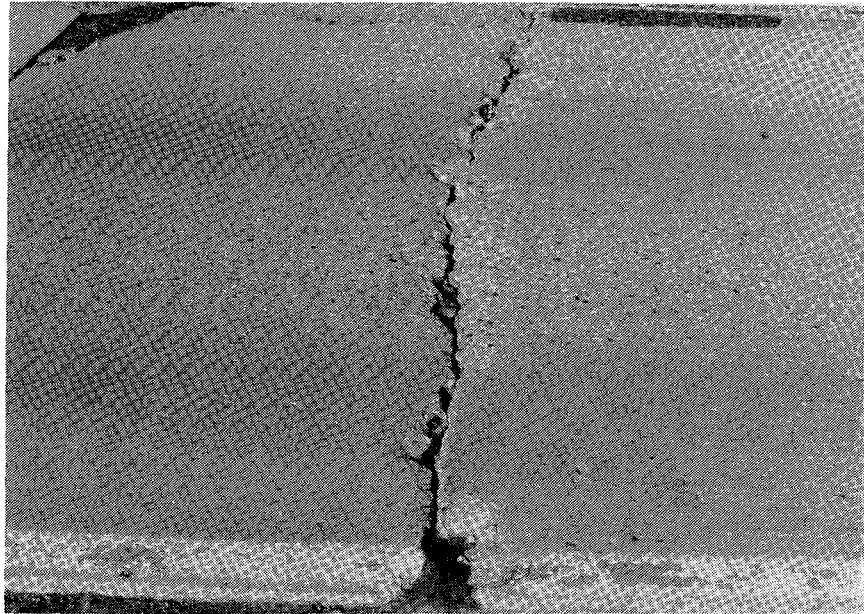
Illustration of transverse cracking rated "severe" on a jointed concrete pavement (JCP-1-IL).
